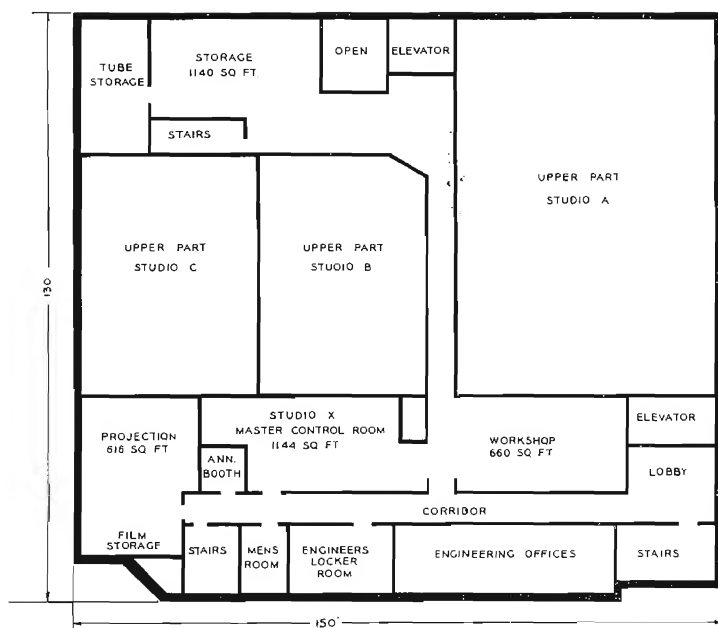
Floor plan of second floor where Master Control and Studio "X" are located.
